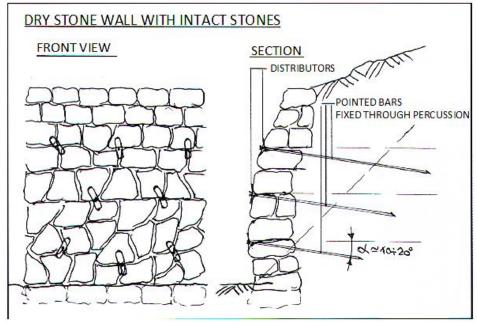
Front view and section of a dry stone wall adjusted with ribbed bars application (figure from Turra, 2009).
